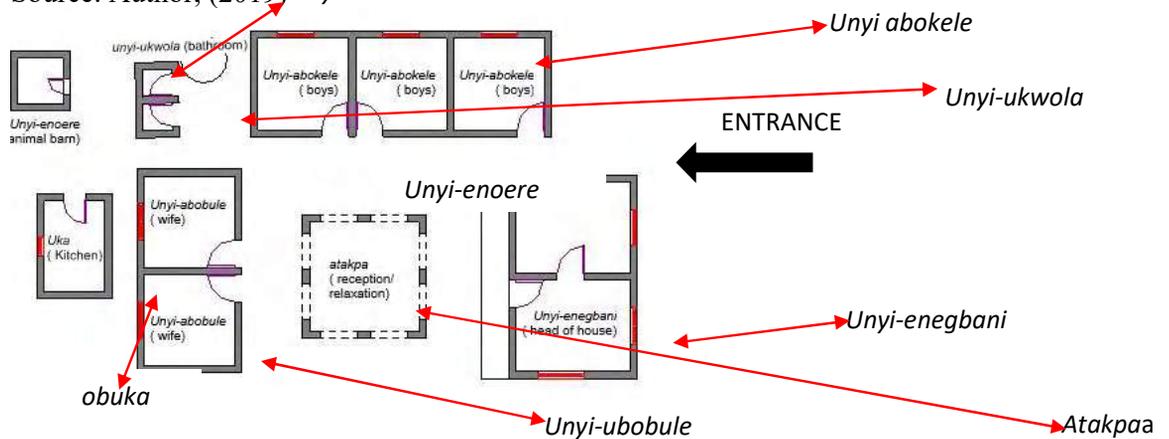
Plate IV: Typical Floor plan of Aji-Tachi and Obeya Community
